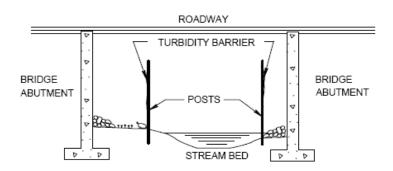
TURBIDITY BARRIER DETAIL SHOWING TYPICAL PLACEMENT AT STRUCTURES
